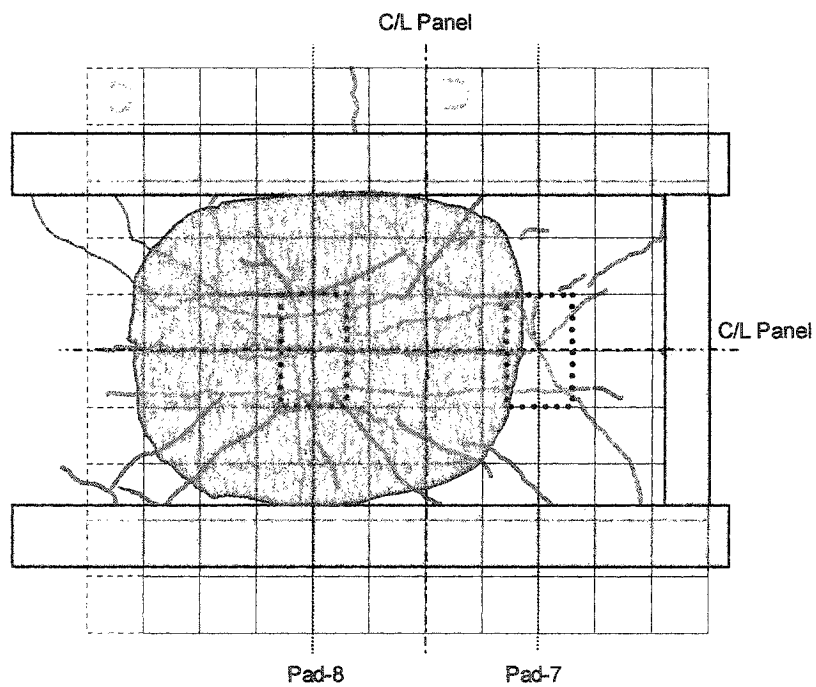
Panel-D: Crack Pattern on Soffit after Failure
